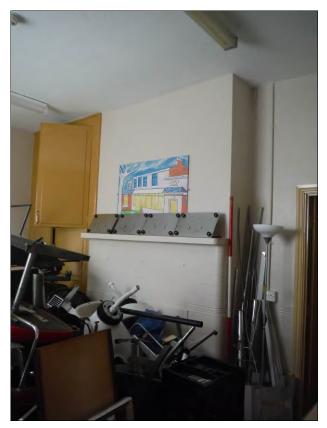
West wall of Room G5 showing the large fireplace and its adjacent cupboard (Scale = 2m).
